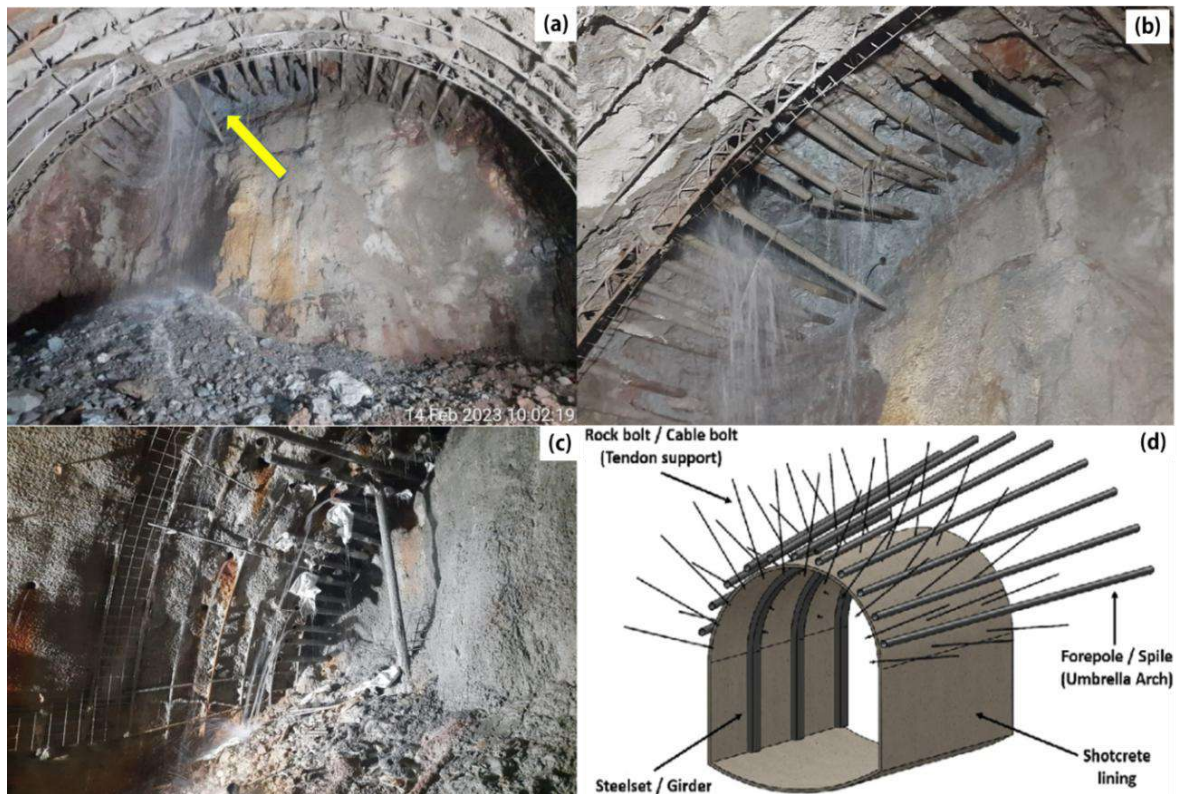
Cavity Formation at Tunnel No. 8 at Ch. 24+404.315m. (a) left side face collapse, cavity formation and water seepage, (b) damage of primary support (c) backfilling of Cavity and grouting (d) techniques employed to restore cavity
